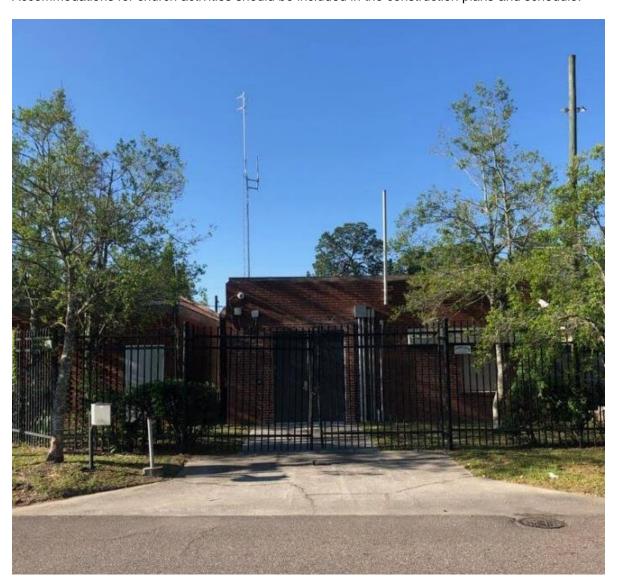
Facing South: West 21st Street, Fairfax WTP – North fence line and general tie-in location for the new 20-inch DIP water main
